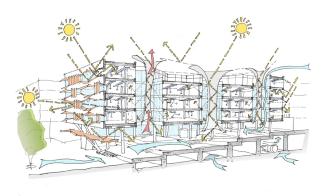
Sketch of the Siemens building showing natural airflows (Arch Daily, 2014)
